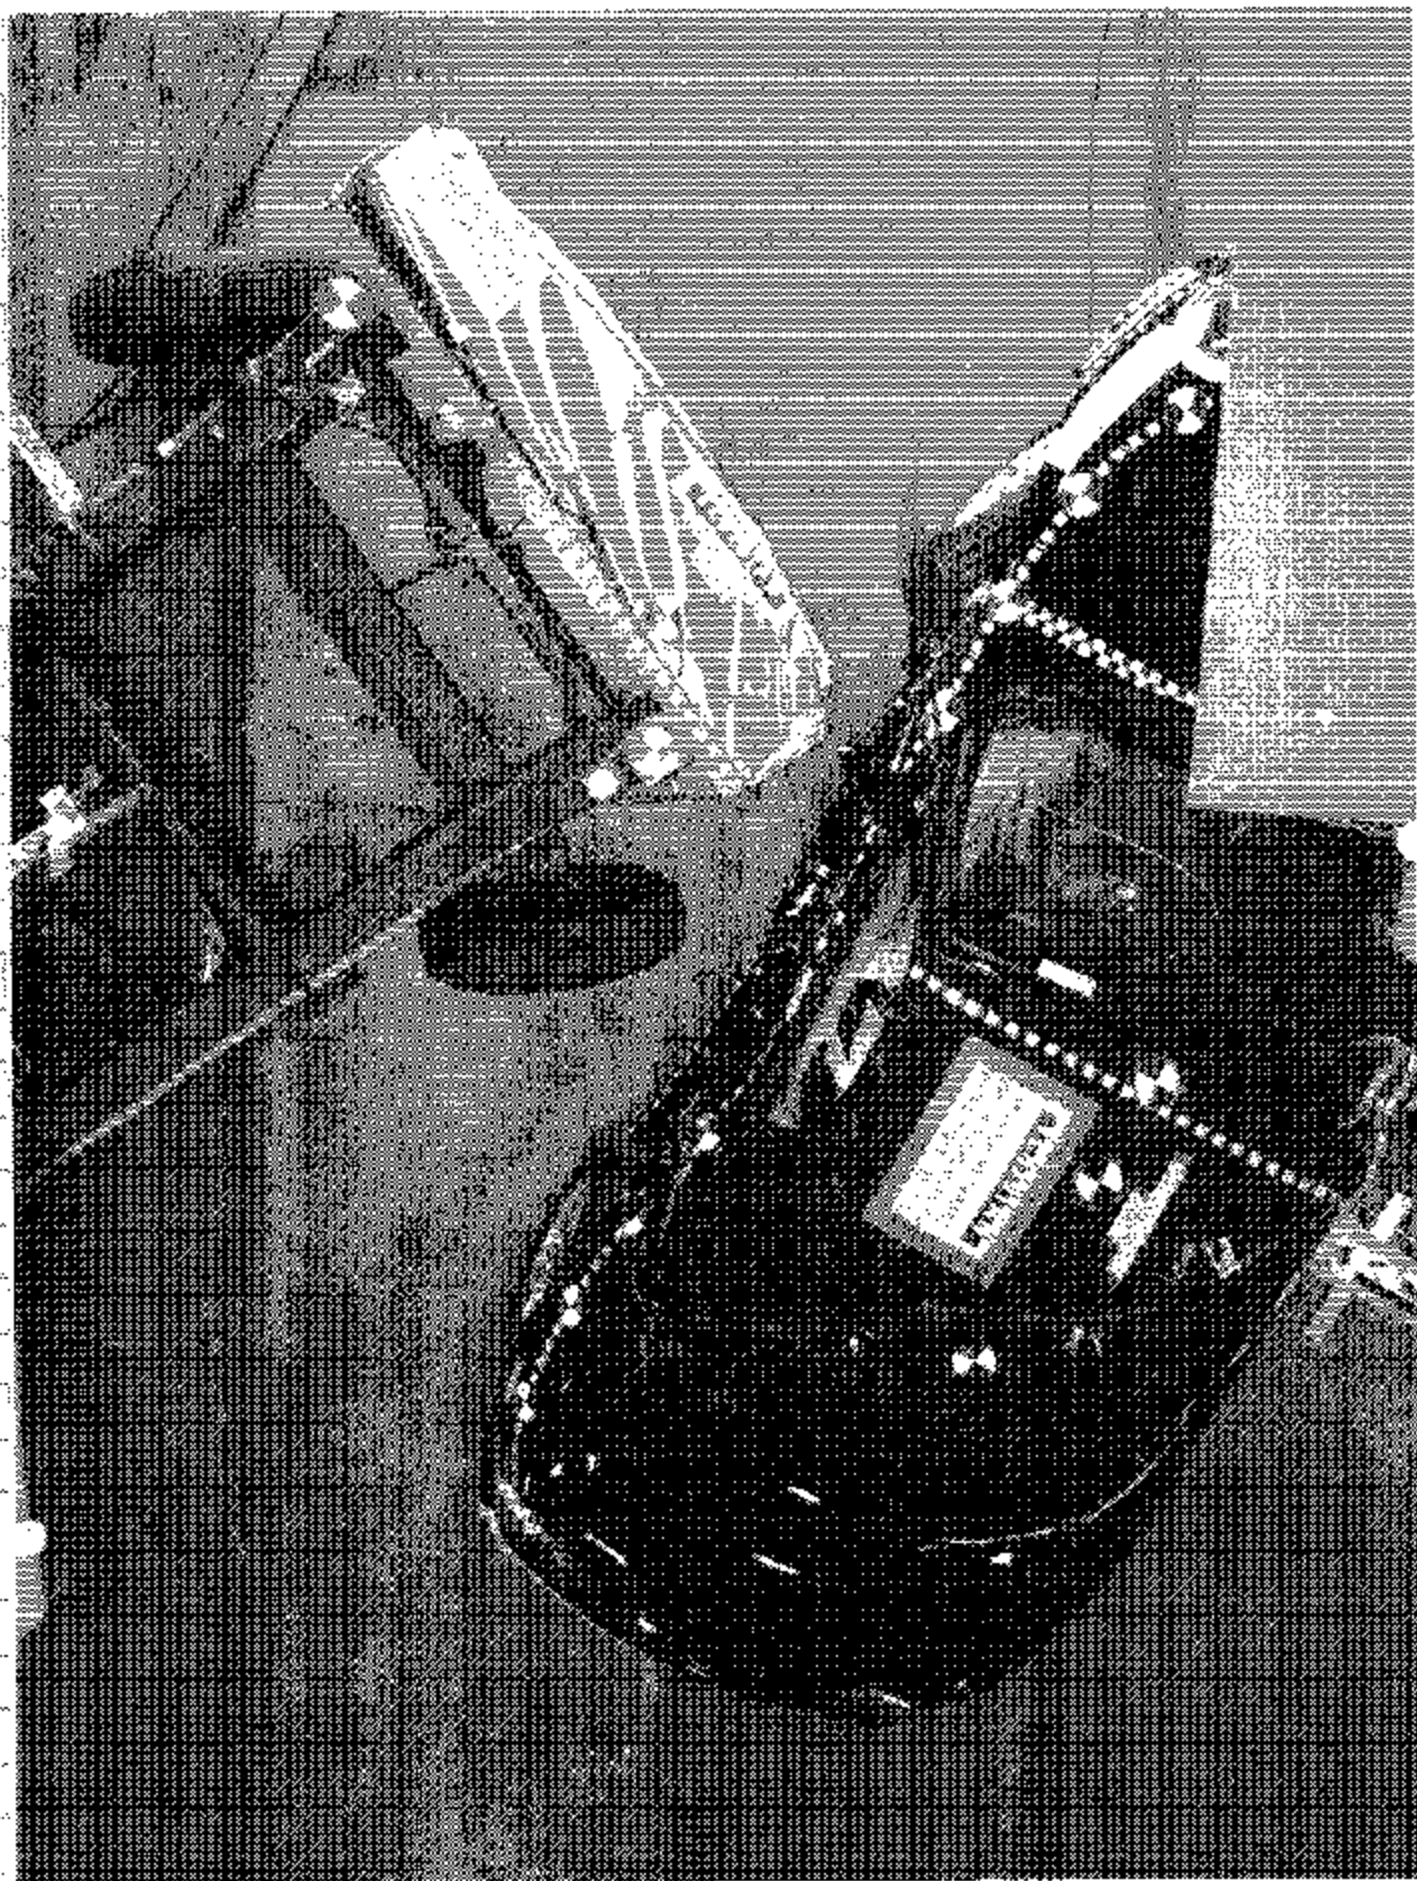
POST-TEST OVERHEAD VIEW OF MLB AND VEHICLE
